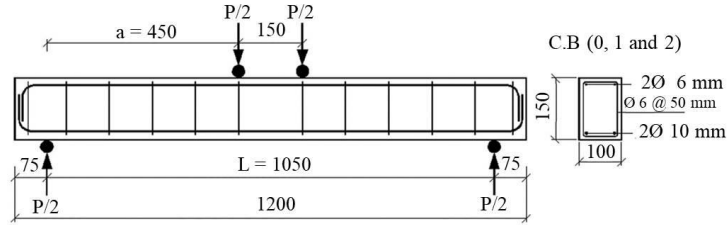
Typical beam geometry and cross-section detailing in mm (Maraq et al., 2021)
